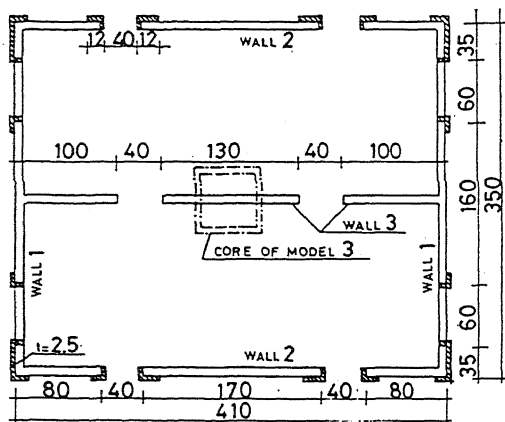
Plan of 2-nd and 3-rd floor of all three models
